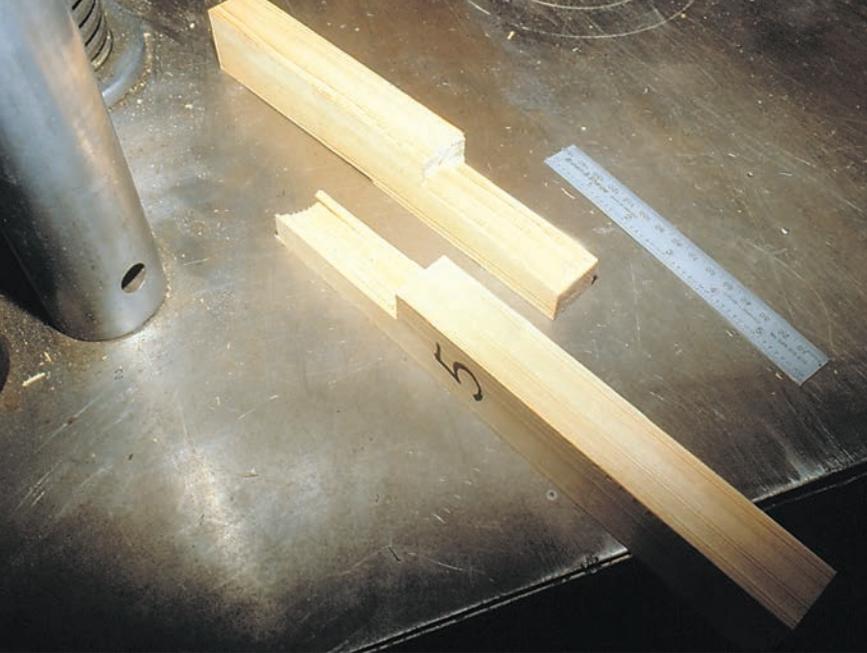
Gluing-test Specimen 5, establishing joint failure mode.
